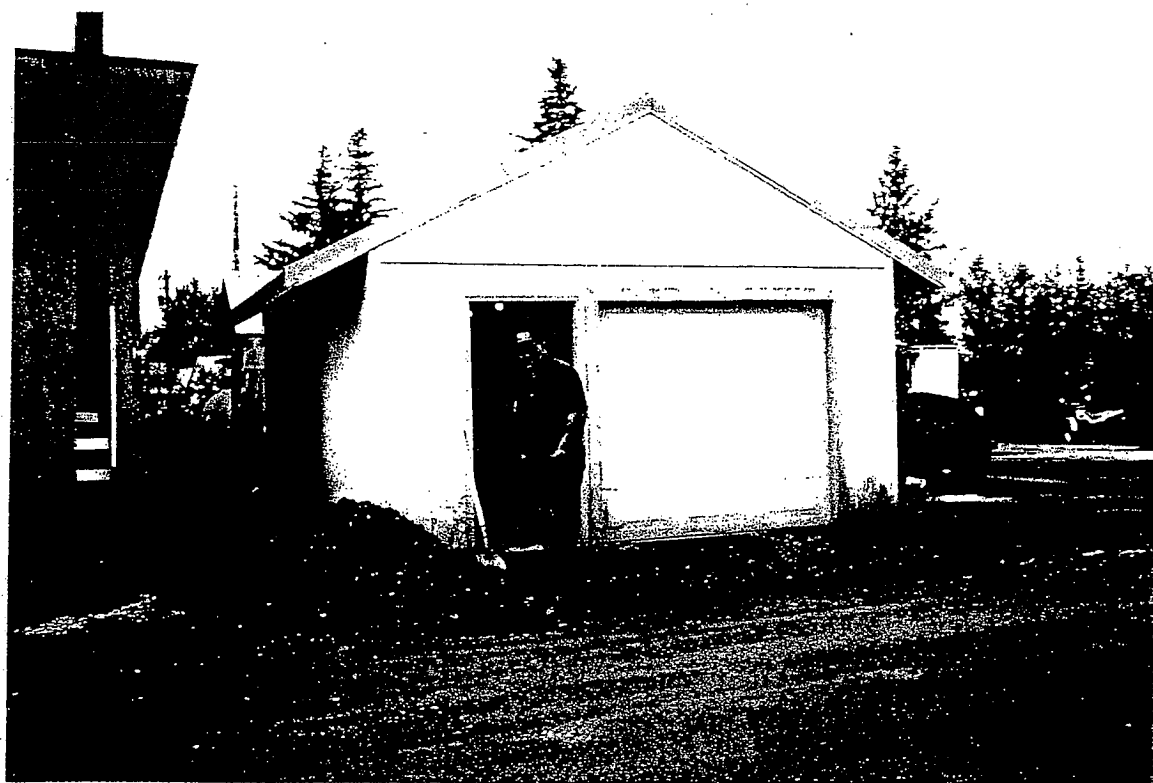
Contaminated Grounding Trench Between Storage Building And Pole Barn
